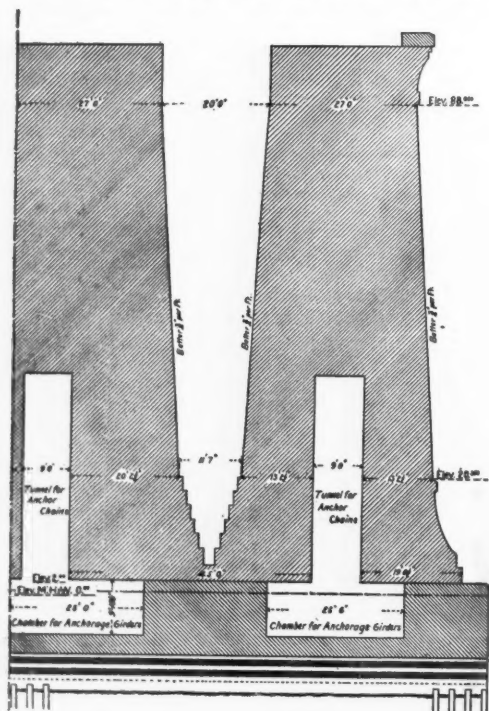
Transverse Section on Center Line of Anchorage Platform.
